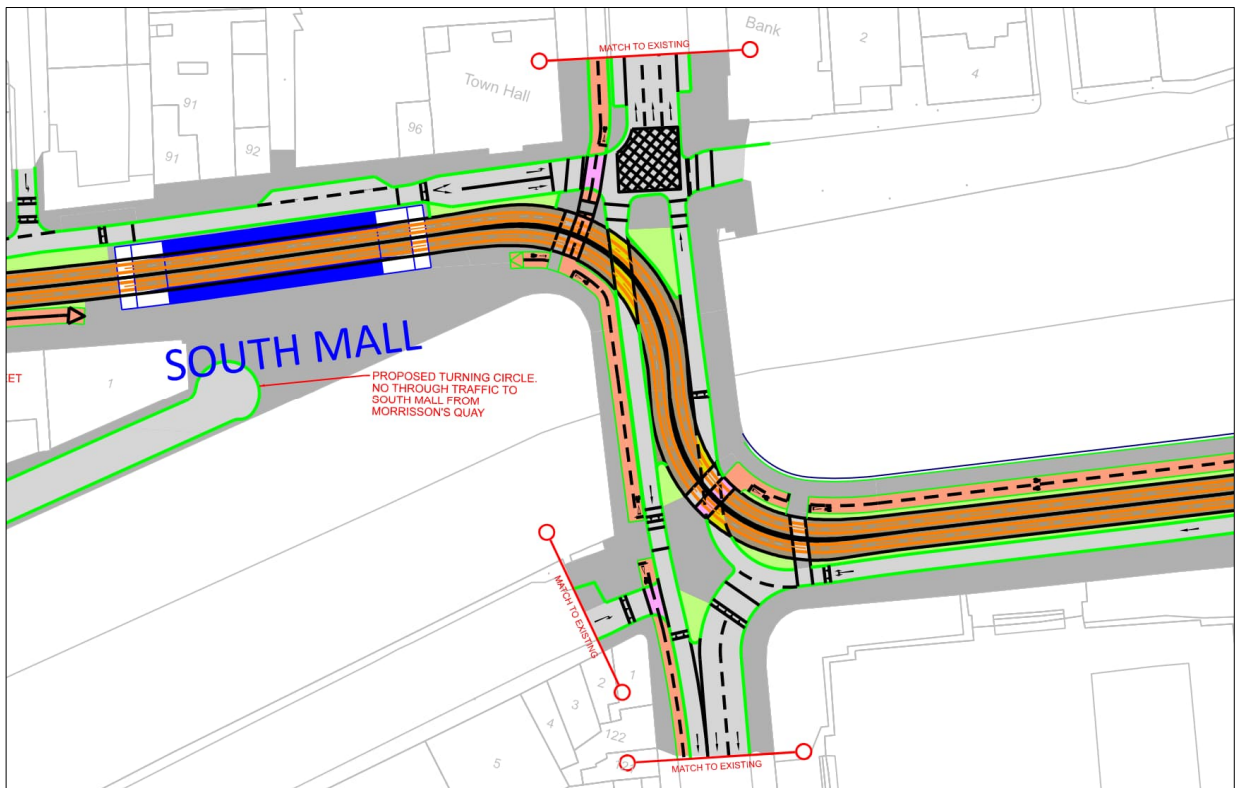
Potential LRT Alignment over Parnell Bridge
